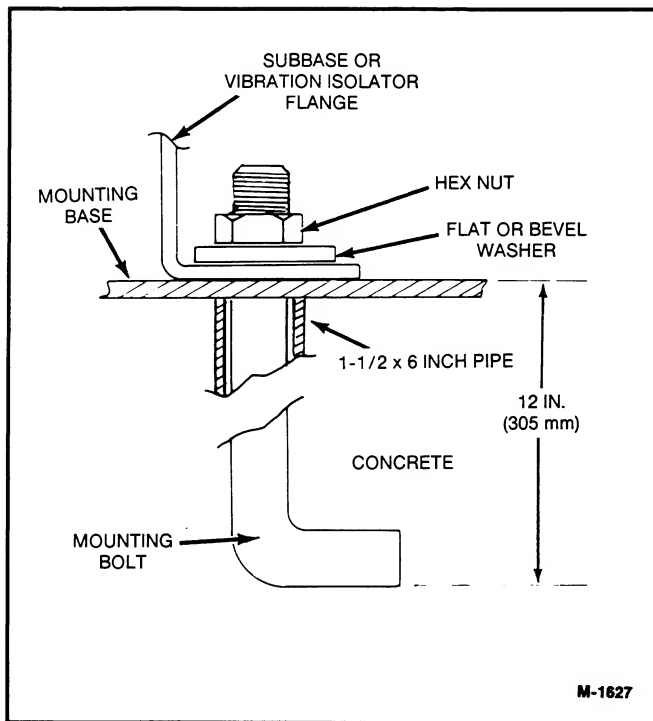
TYPICAL ANCHOR BOLT DIAGRAM
